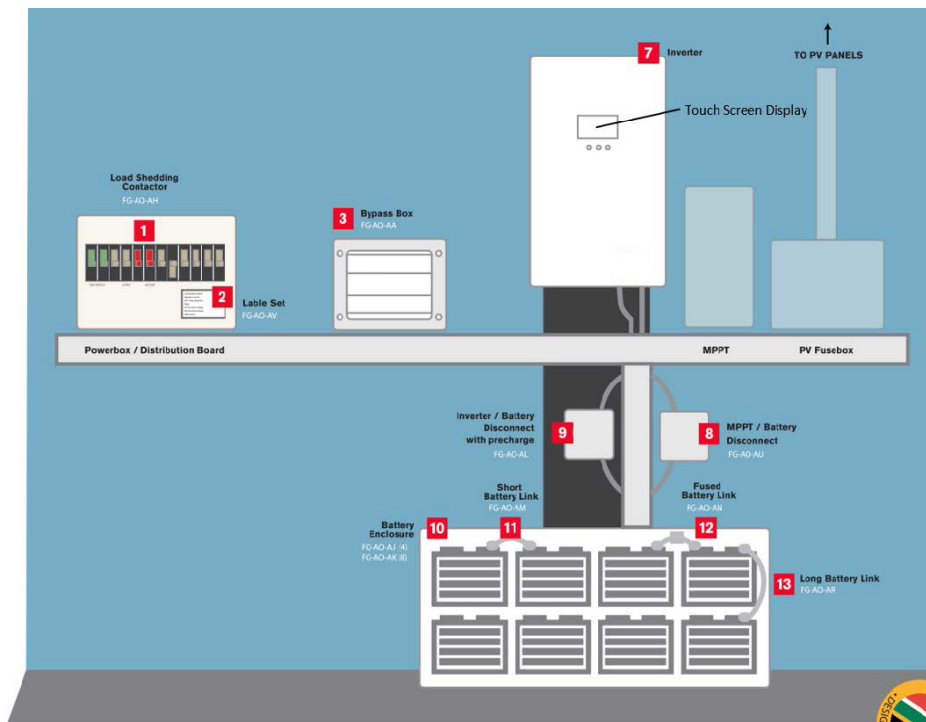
A typical layout of a single-phase Powerstar 10H installation
